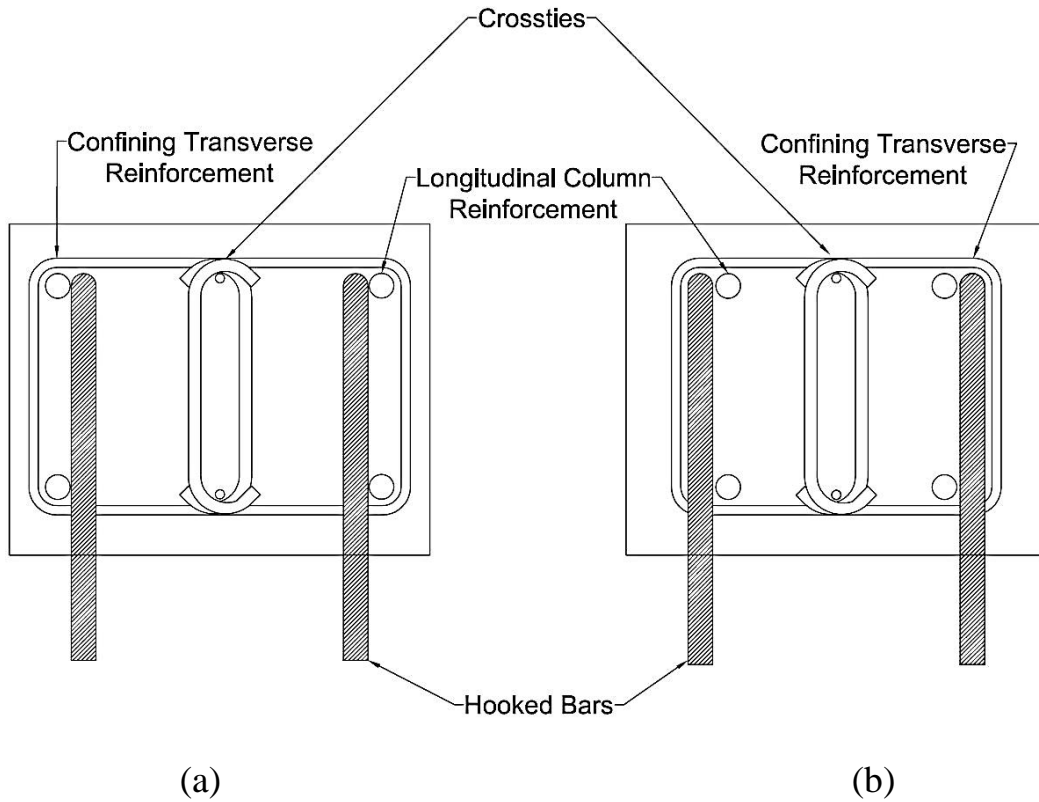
Cross section detail of specimens with hooks placed (a) inside column core and (b) outside column core
